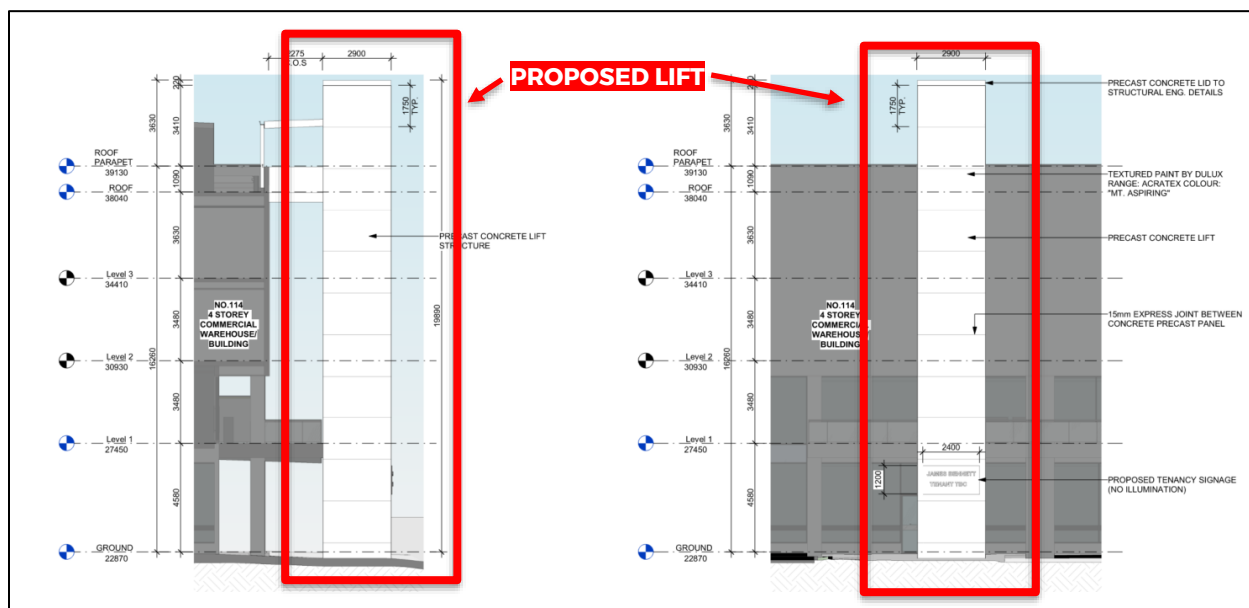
Proposed Goods and Passengers Lift (Source: Reid Campbell, 2024)
